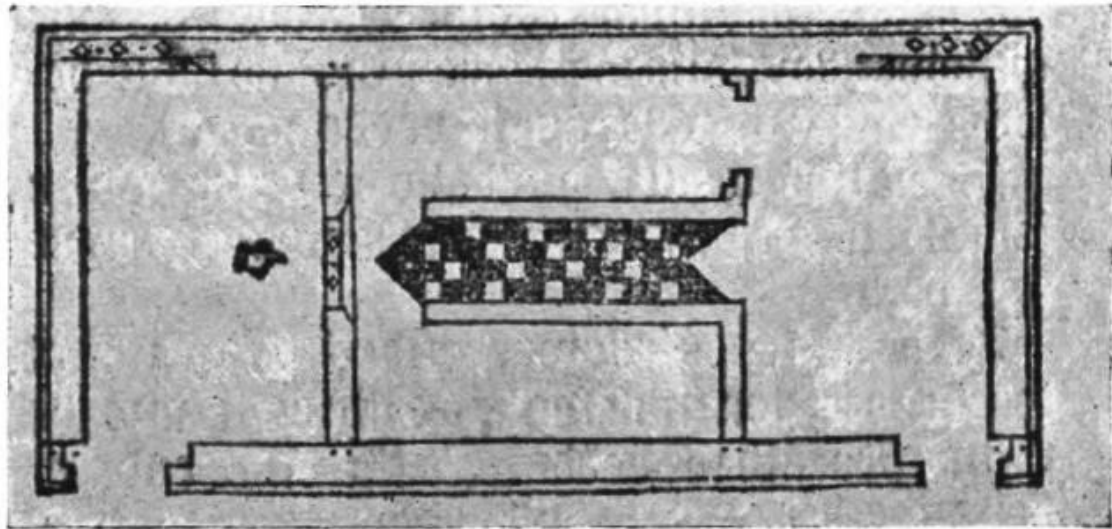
Ground plan of oast-house in Kent, 1574.
